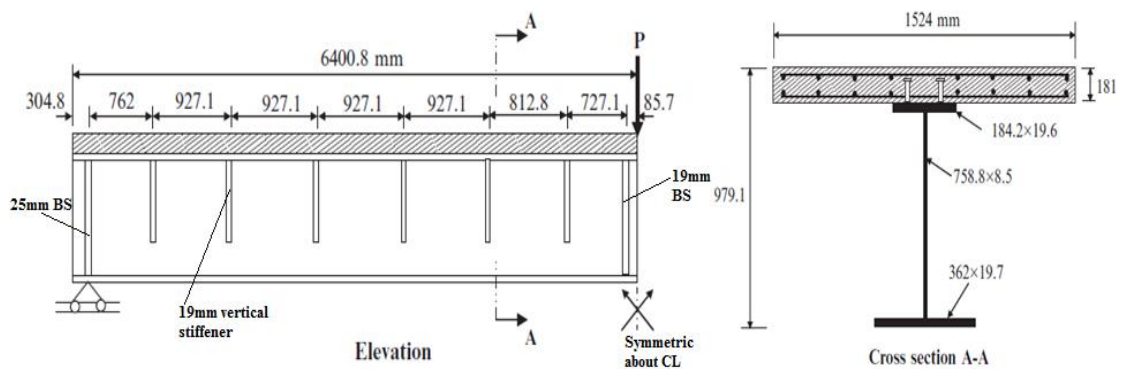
Longitudinal and cross-sectional view of steel-concrete composite girder
